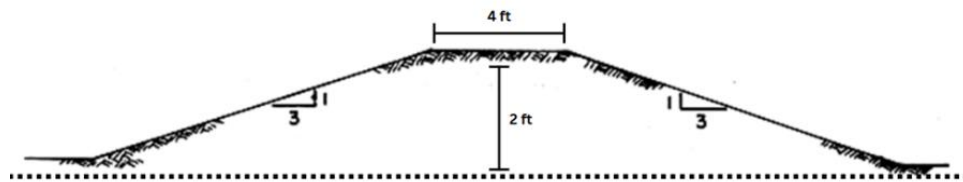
Design for the two feet tall dike. Note: the design is not to scale, (National Engineering Handbook, n.d.).
